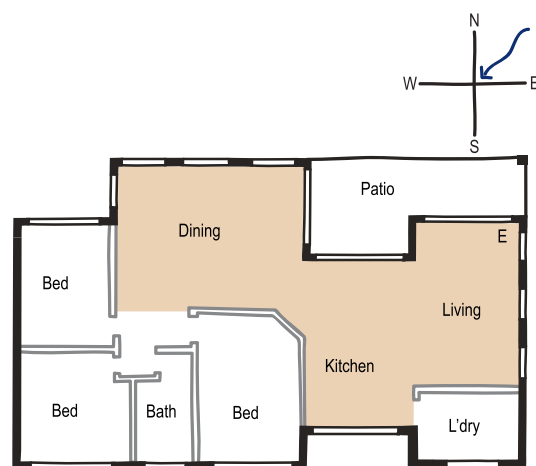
A Townsville climate-responsive house plan created by mirroring the original "bad" plan in Figure 6.
